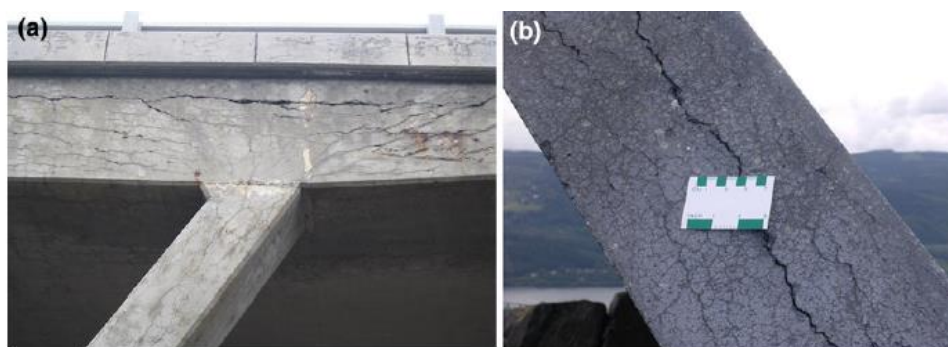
ASR induced crack pattern in reinforced concrete [24]
